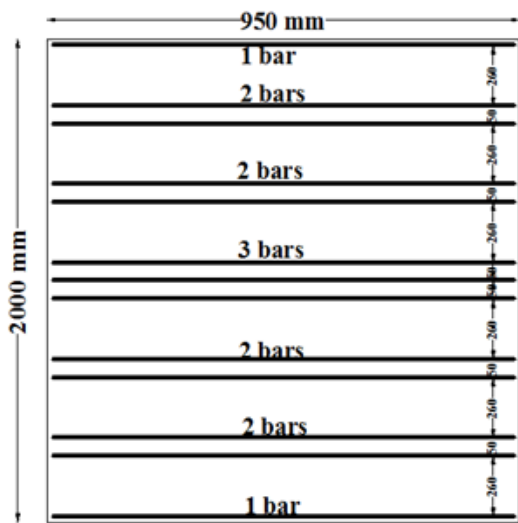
Plan of slab reinforcement distribution for specimen (GIIA-1)
